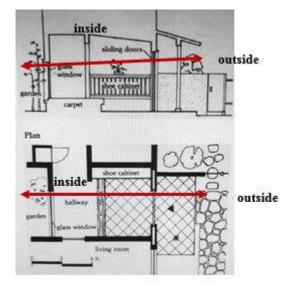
Visual continuity from the garden outside to the courtyard garden inside is achieved in this plan
